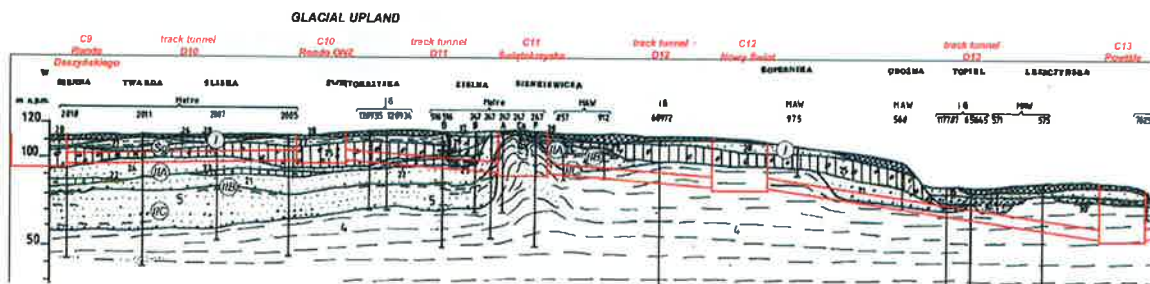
Cross Section of Tunnel from C9 to C13
